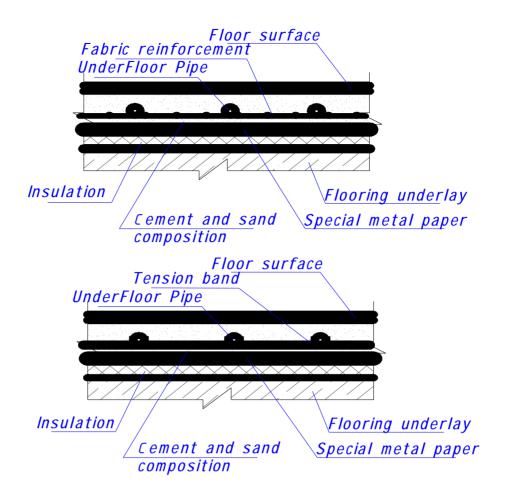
The floor construction with the concrete layout /9, p. 7, 8/
